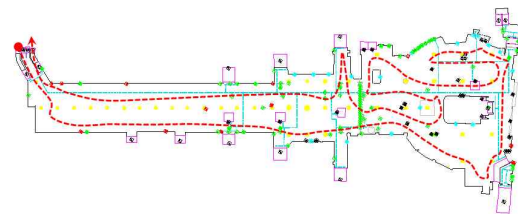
Yongdeungpo station 1st Basement floor viewing plan
